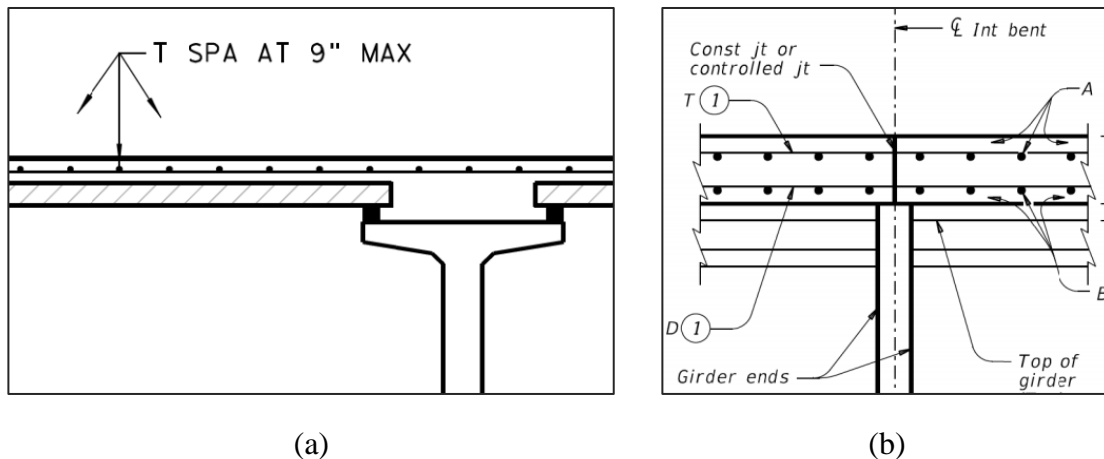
Reinforcement details of bridge decks: (a) Decks over girders; (b) Link slabs.
